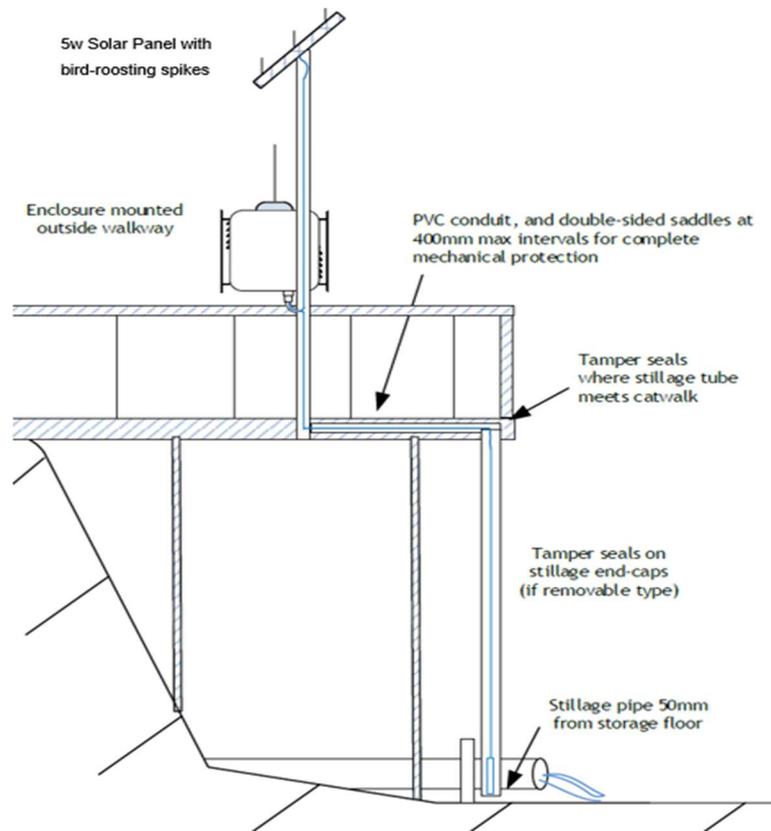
Installation Type 2 storage meter - elevated platform with a submersible pressure sensor for storage metering.
